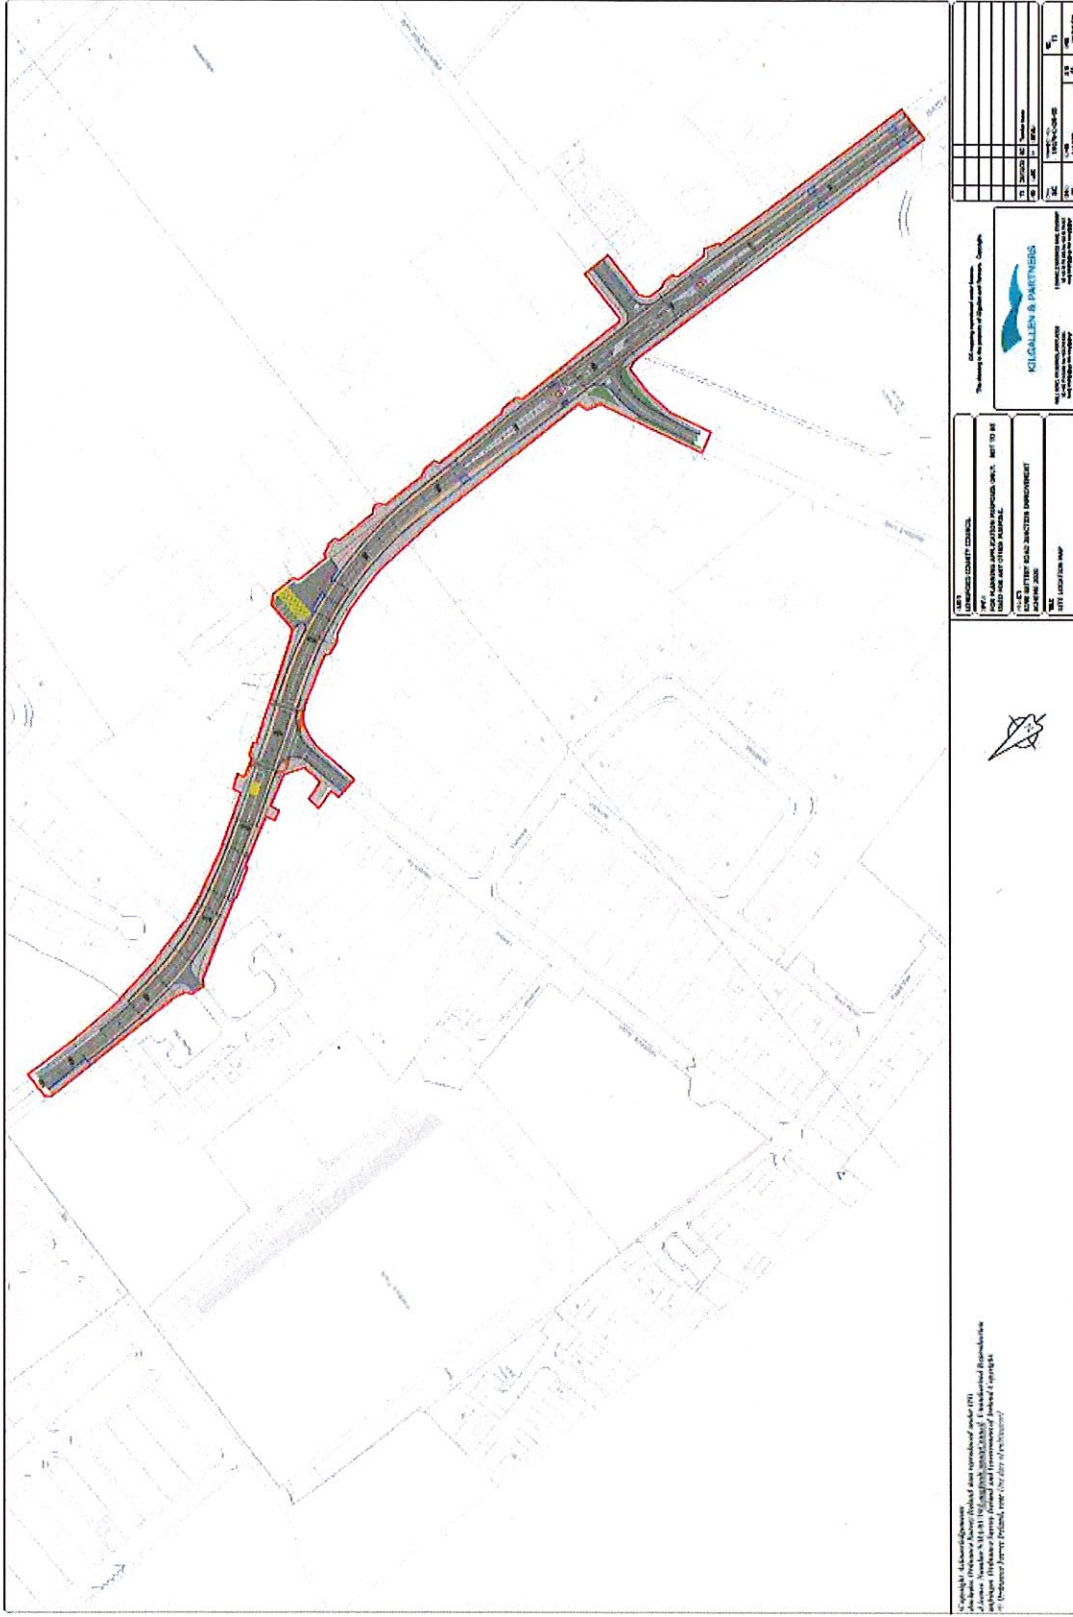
SITE LAYOUT (KILGALLEN & PARTNERS, 2020. DRAWING NO 19079-C-DR-00)
